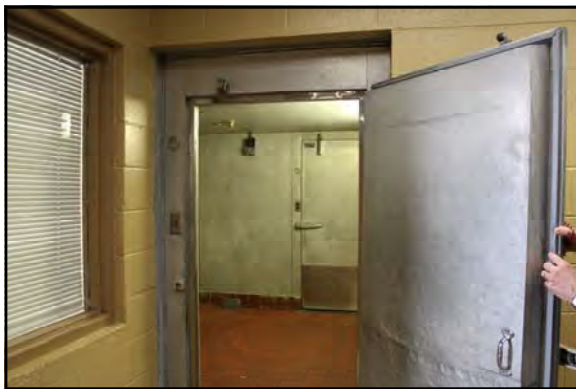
## PHOTOS - MAIN BUILDING "3RD FLOOR"
